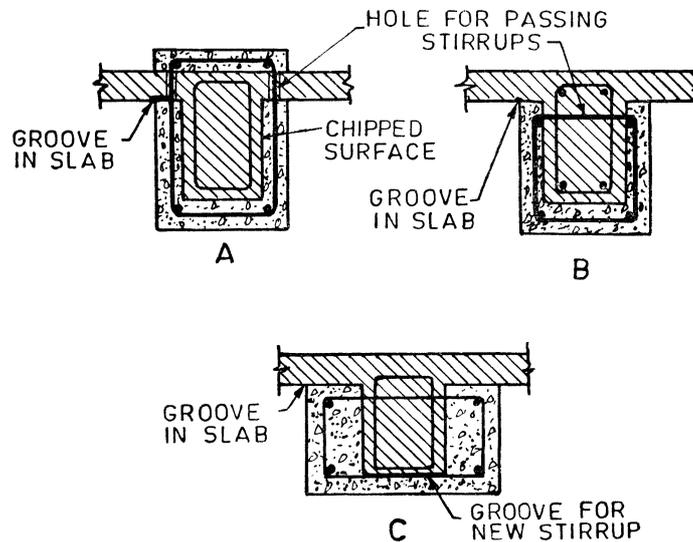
INCREASING THE SECTION AND REINFORCEMENT OF EXISTING BEAMS
